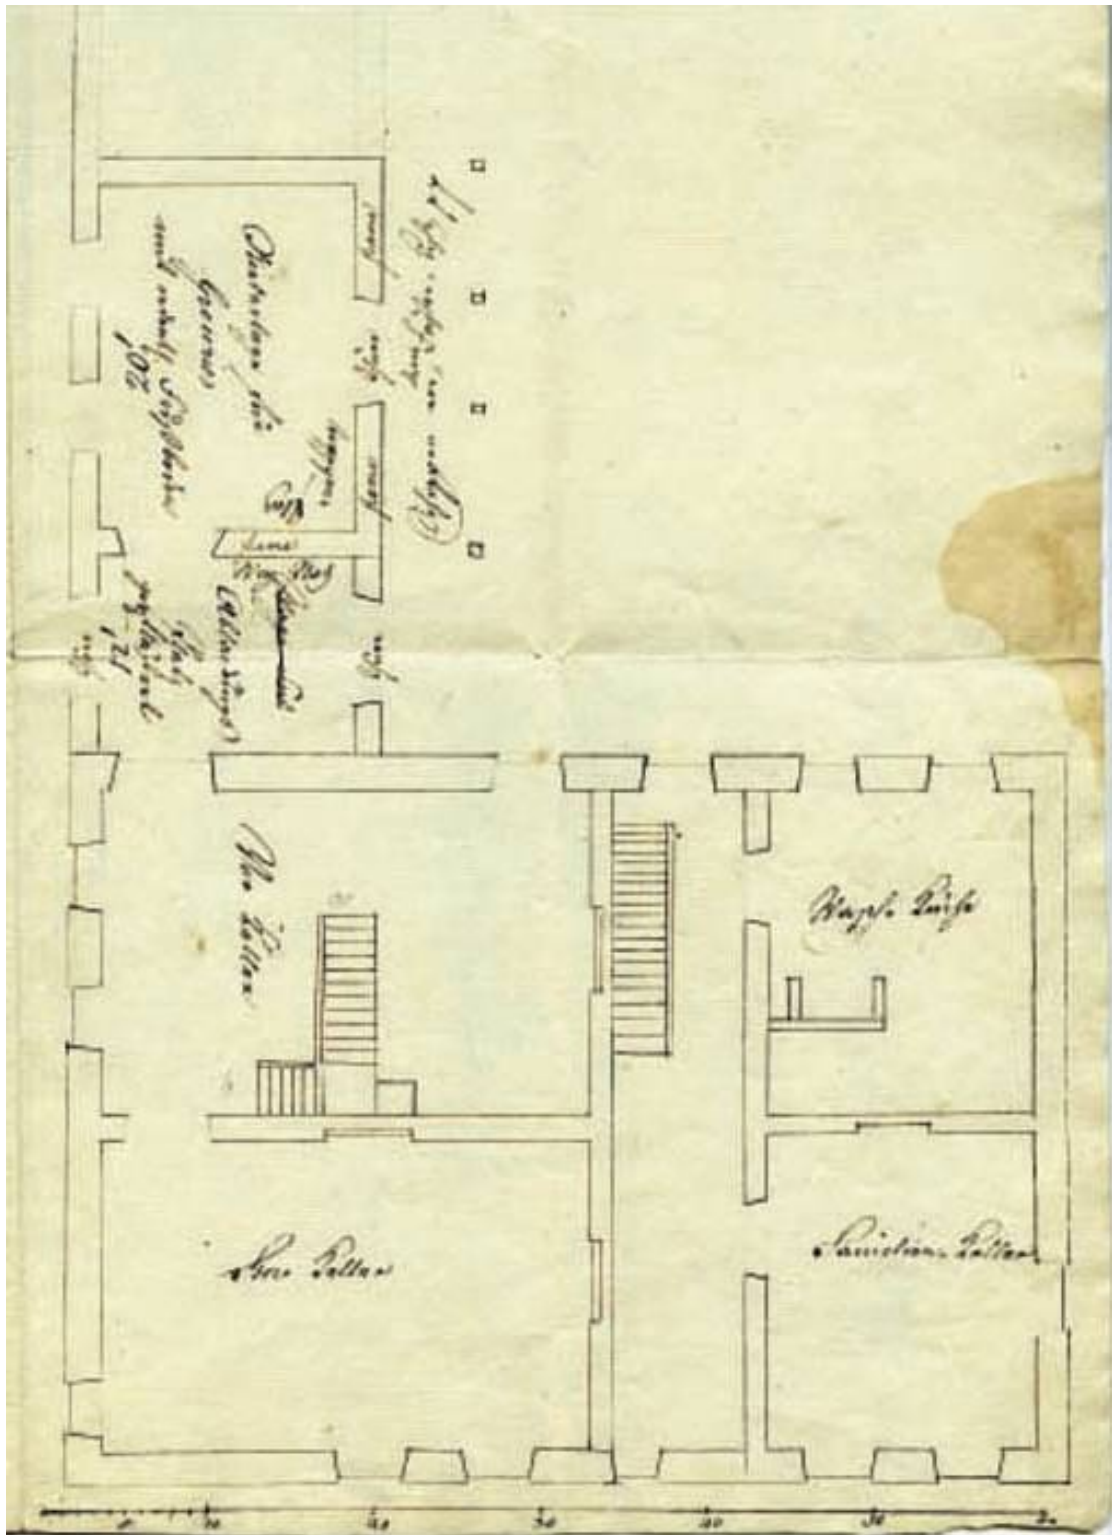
Undated Plans, c. 1773. Cellar Floor.
